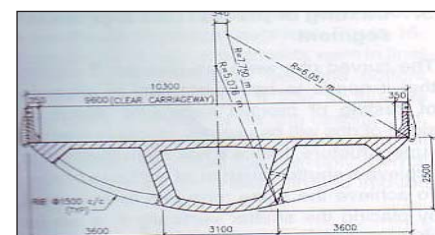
Cross-section of 10.3 m wide box (Spine Box Type-1), (RIB TYPE-1)
